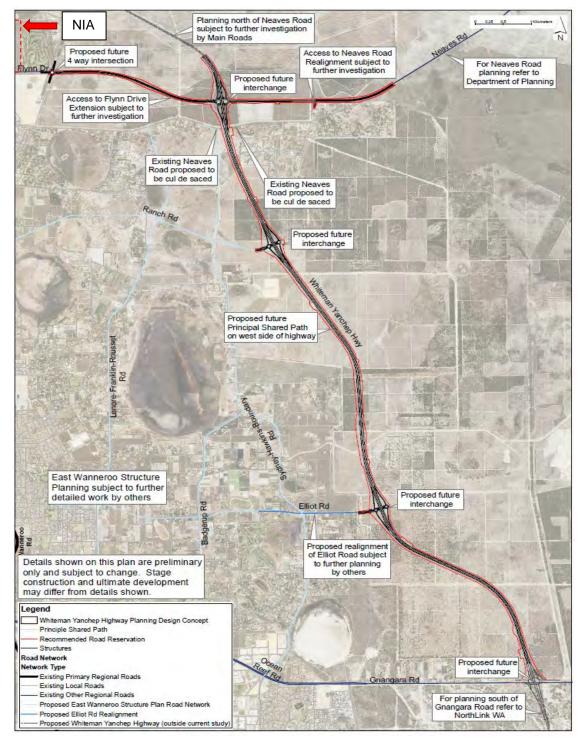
Whiteman-Yanchep Highway, Gnangara Road to Neaves Road (MRWA)
